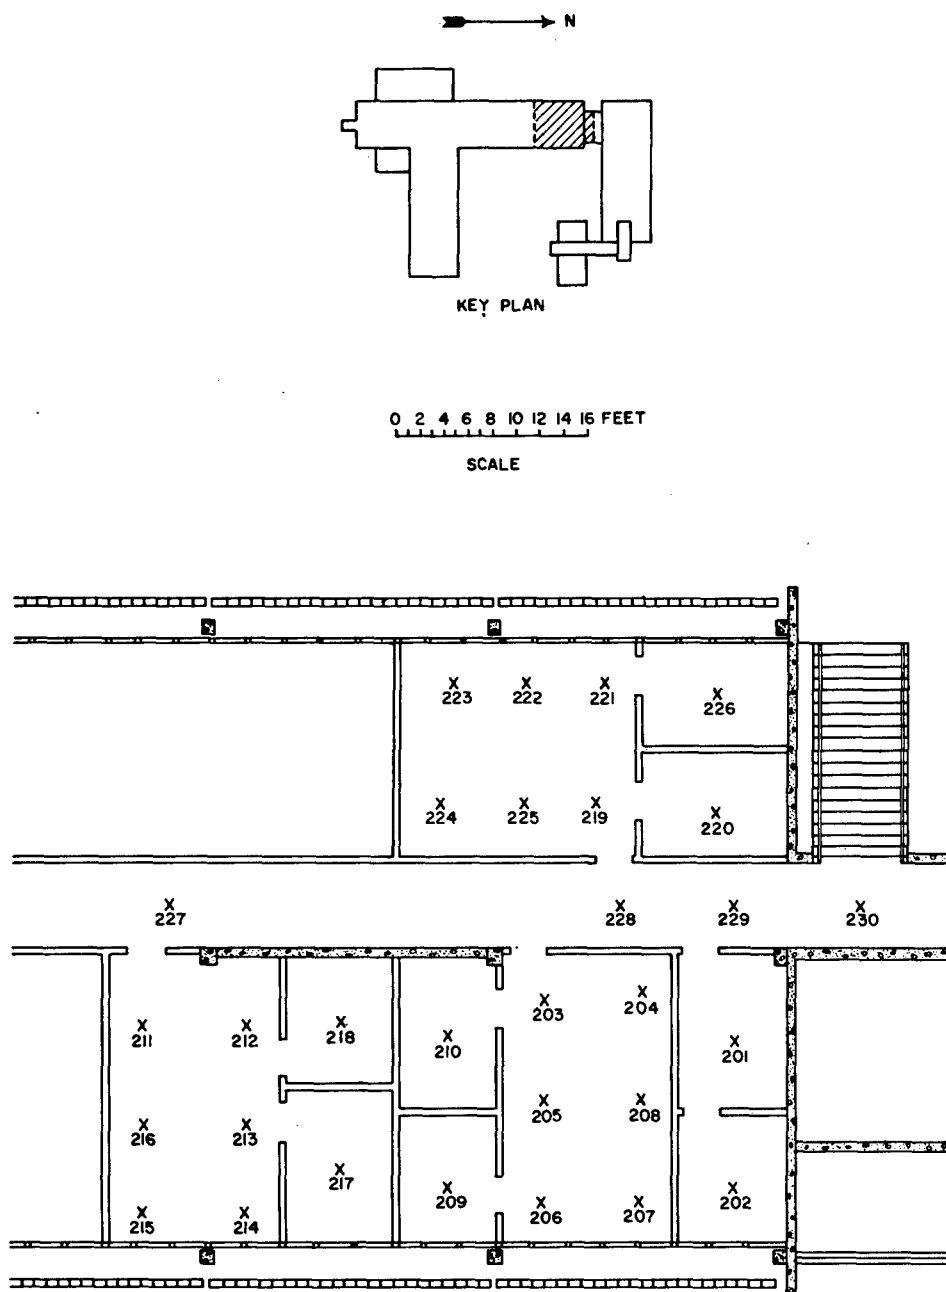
Second-floor plan of UCLA structure with detector positions indicated.
